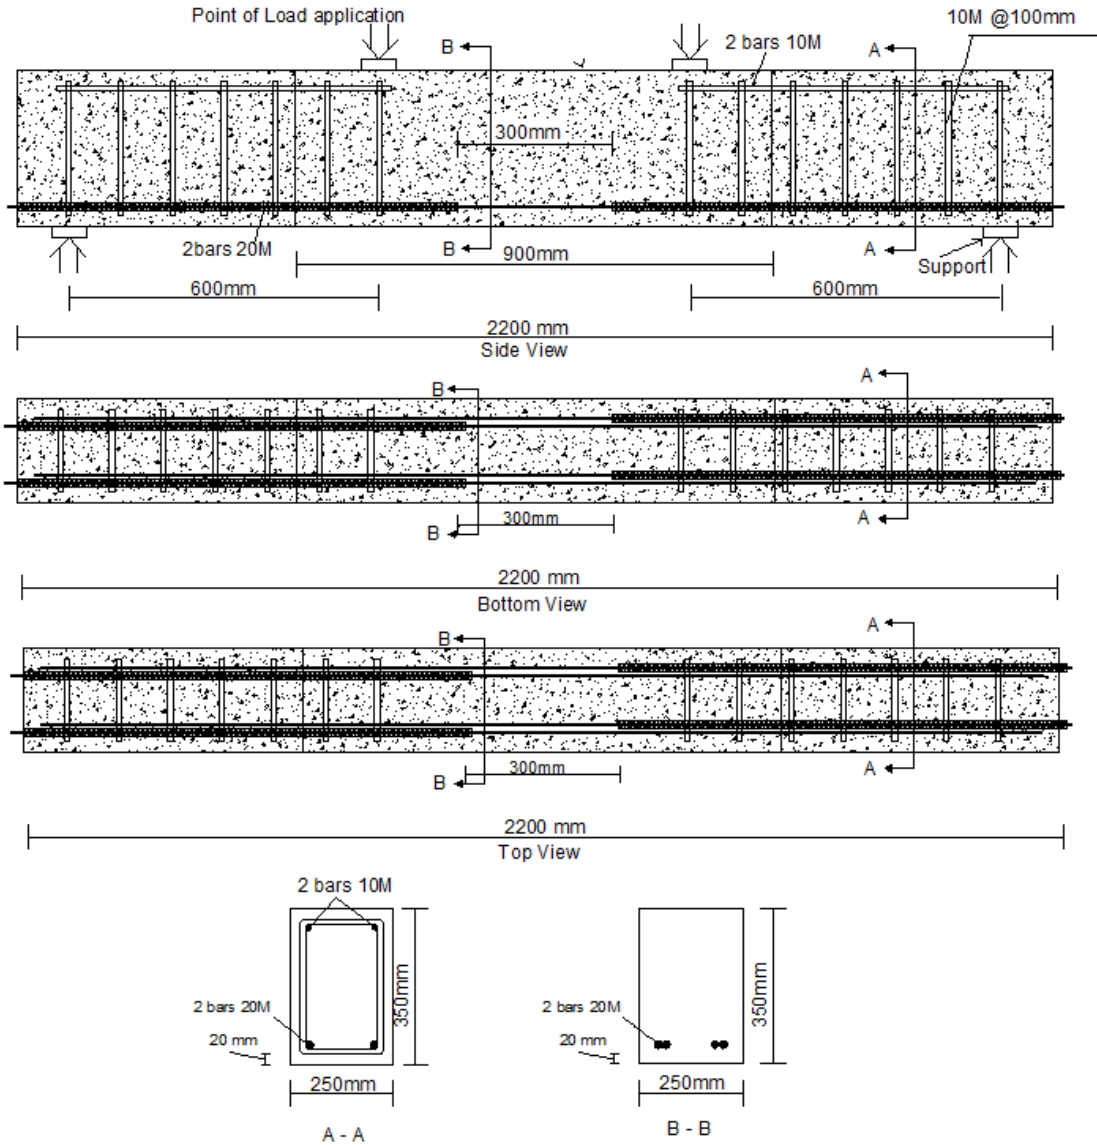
Beam cross-section and reinforcement layout along the span for Group 1
